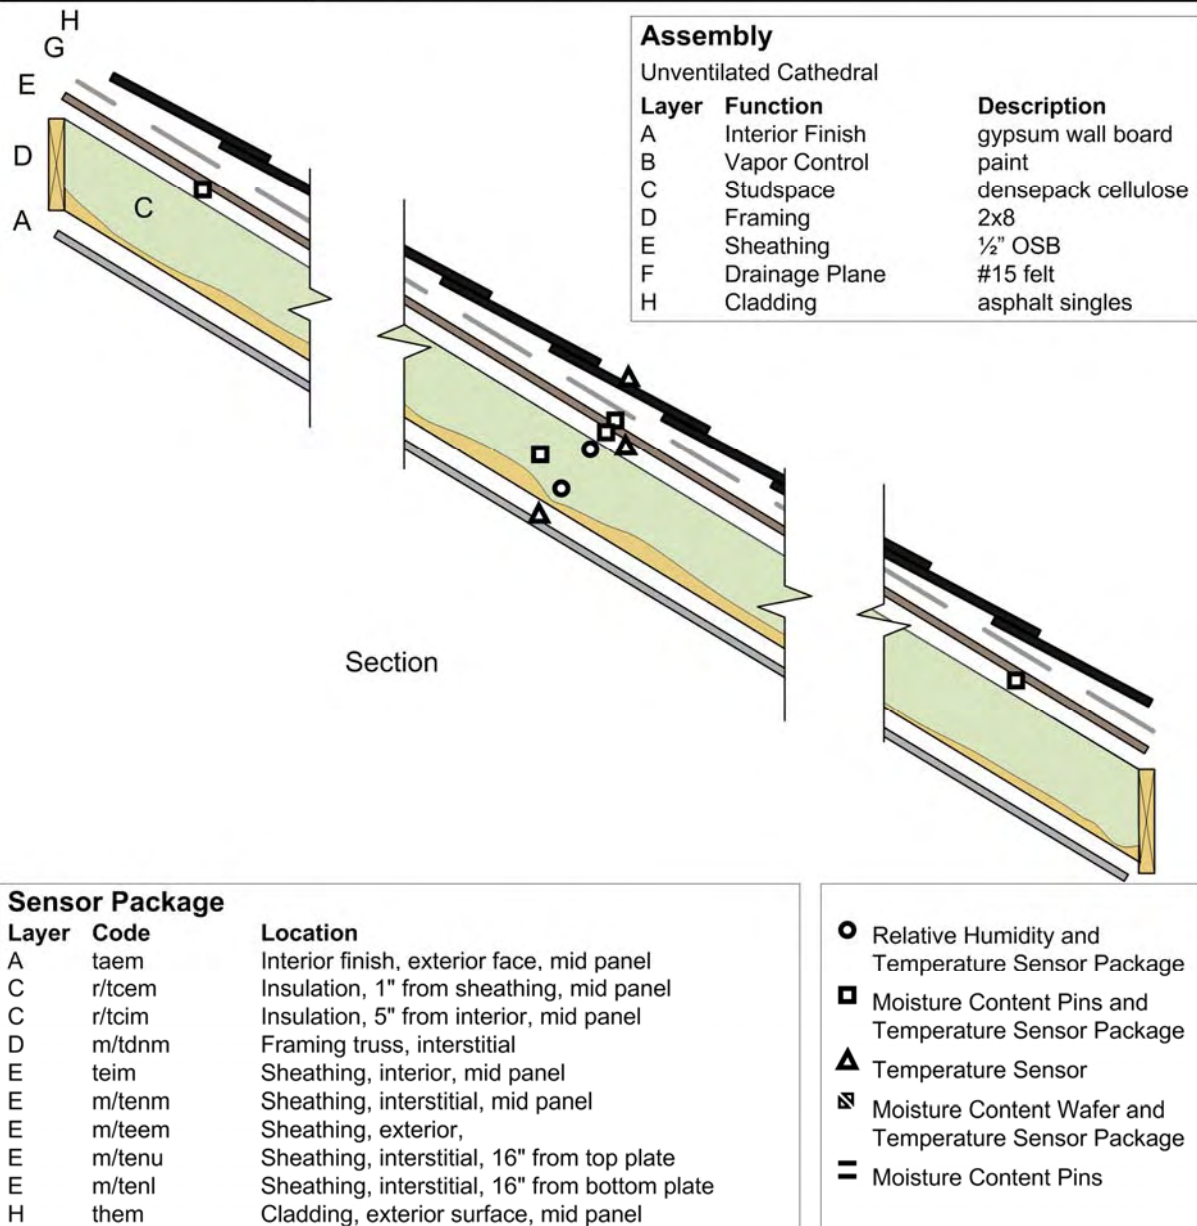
Atlanta Roof 8: Unvented Cathedral Ceiling, construction and sensor layout
